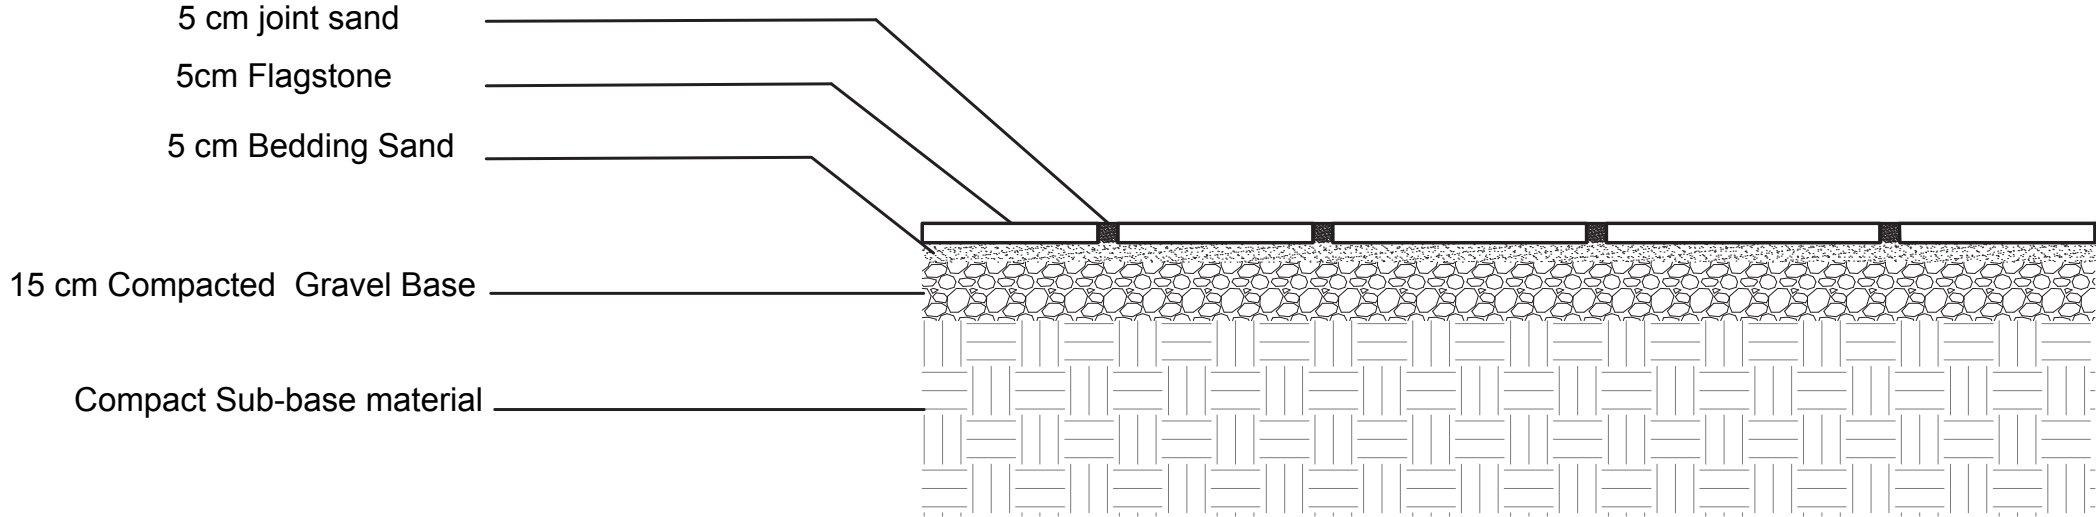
Paving Pattern of Flagstone / Detailed Section
